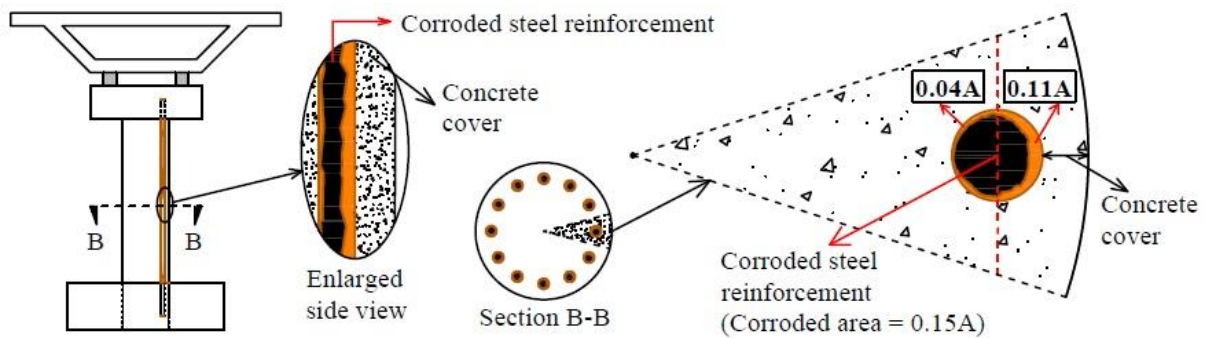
Details of corroded steel reinforcement in a bridge pier
